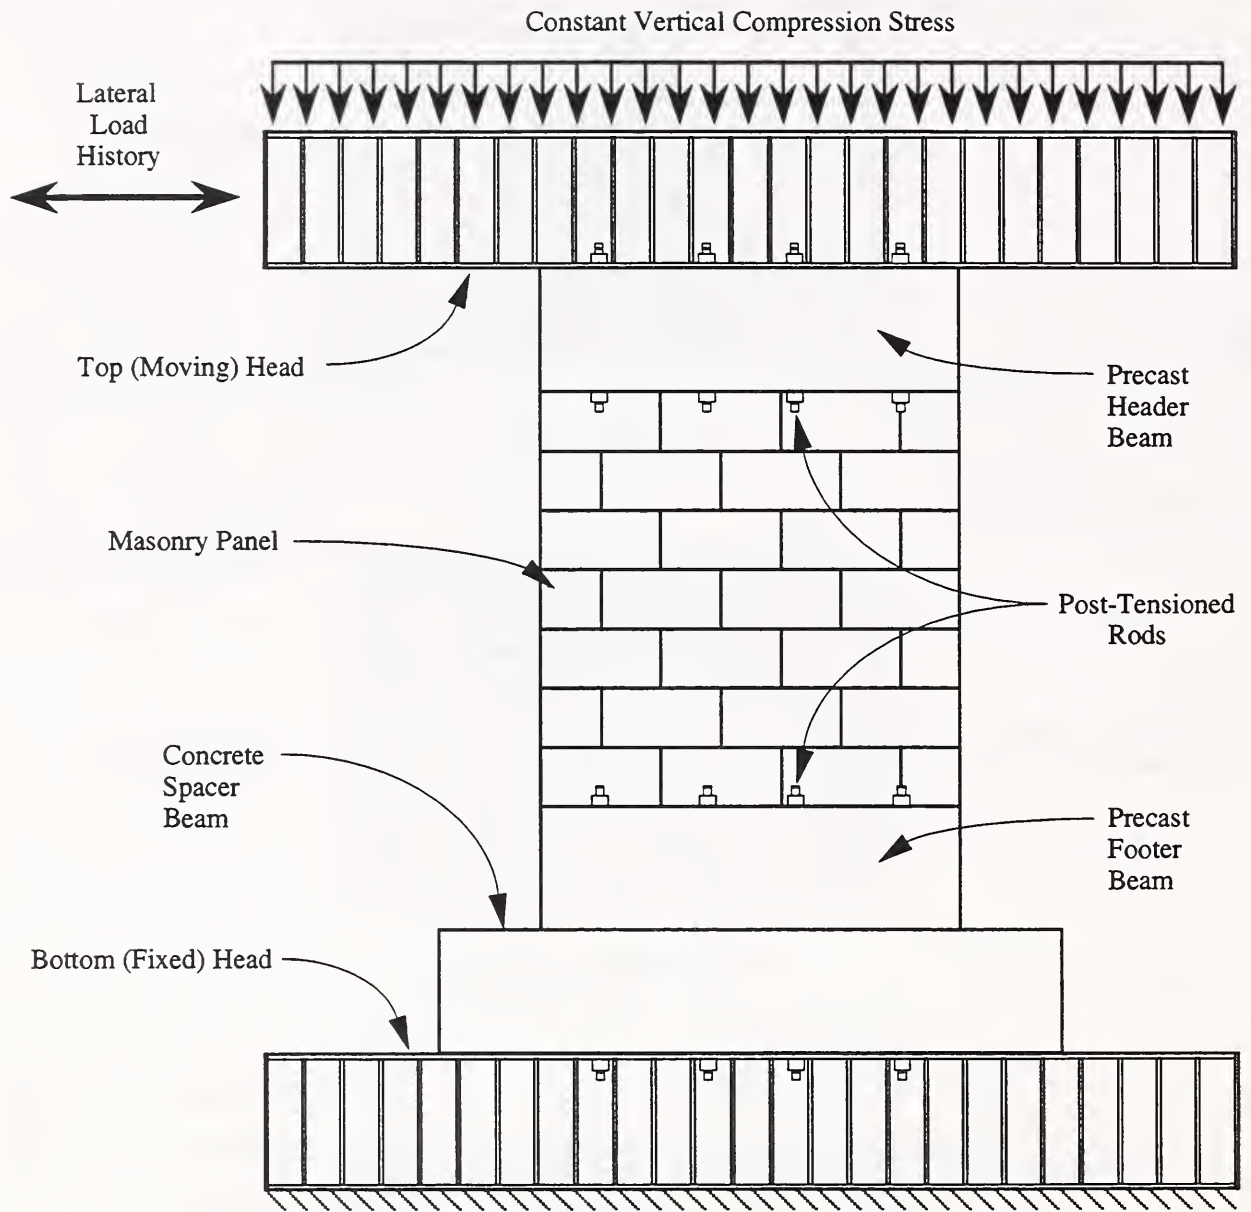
Test Setup for Partially-Grouted Masonry Shear Wall Specimens
